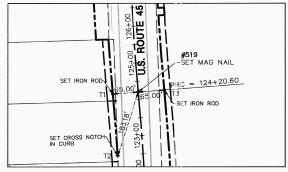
DETAIL OF POINT NO. 519 SCALE: 1" = 120'
